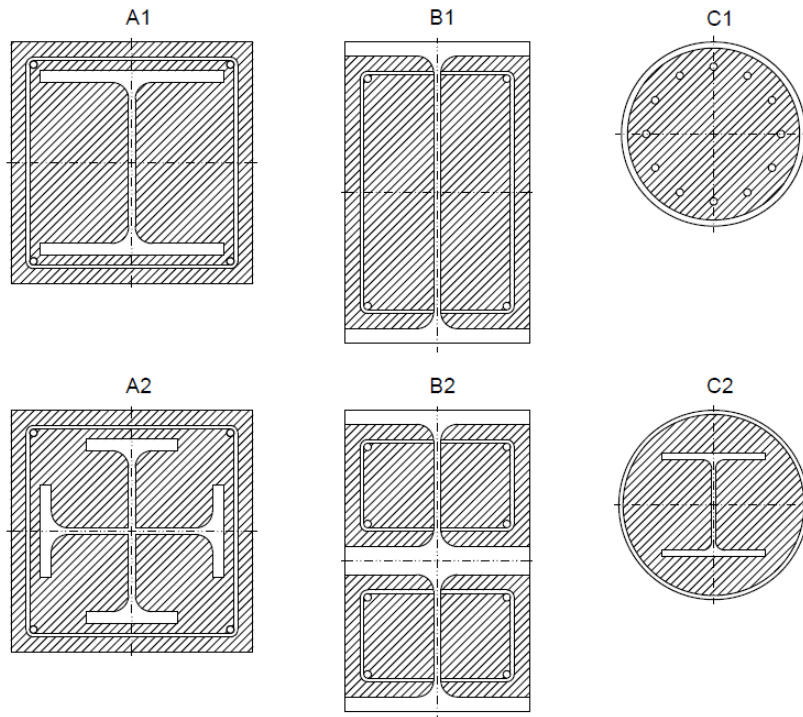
Examples of composite column cross-sections using standard steel sections, inspired by [3].
